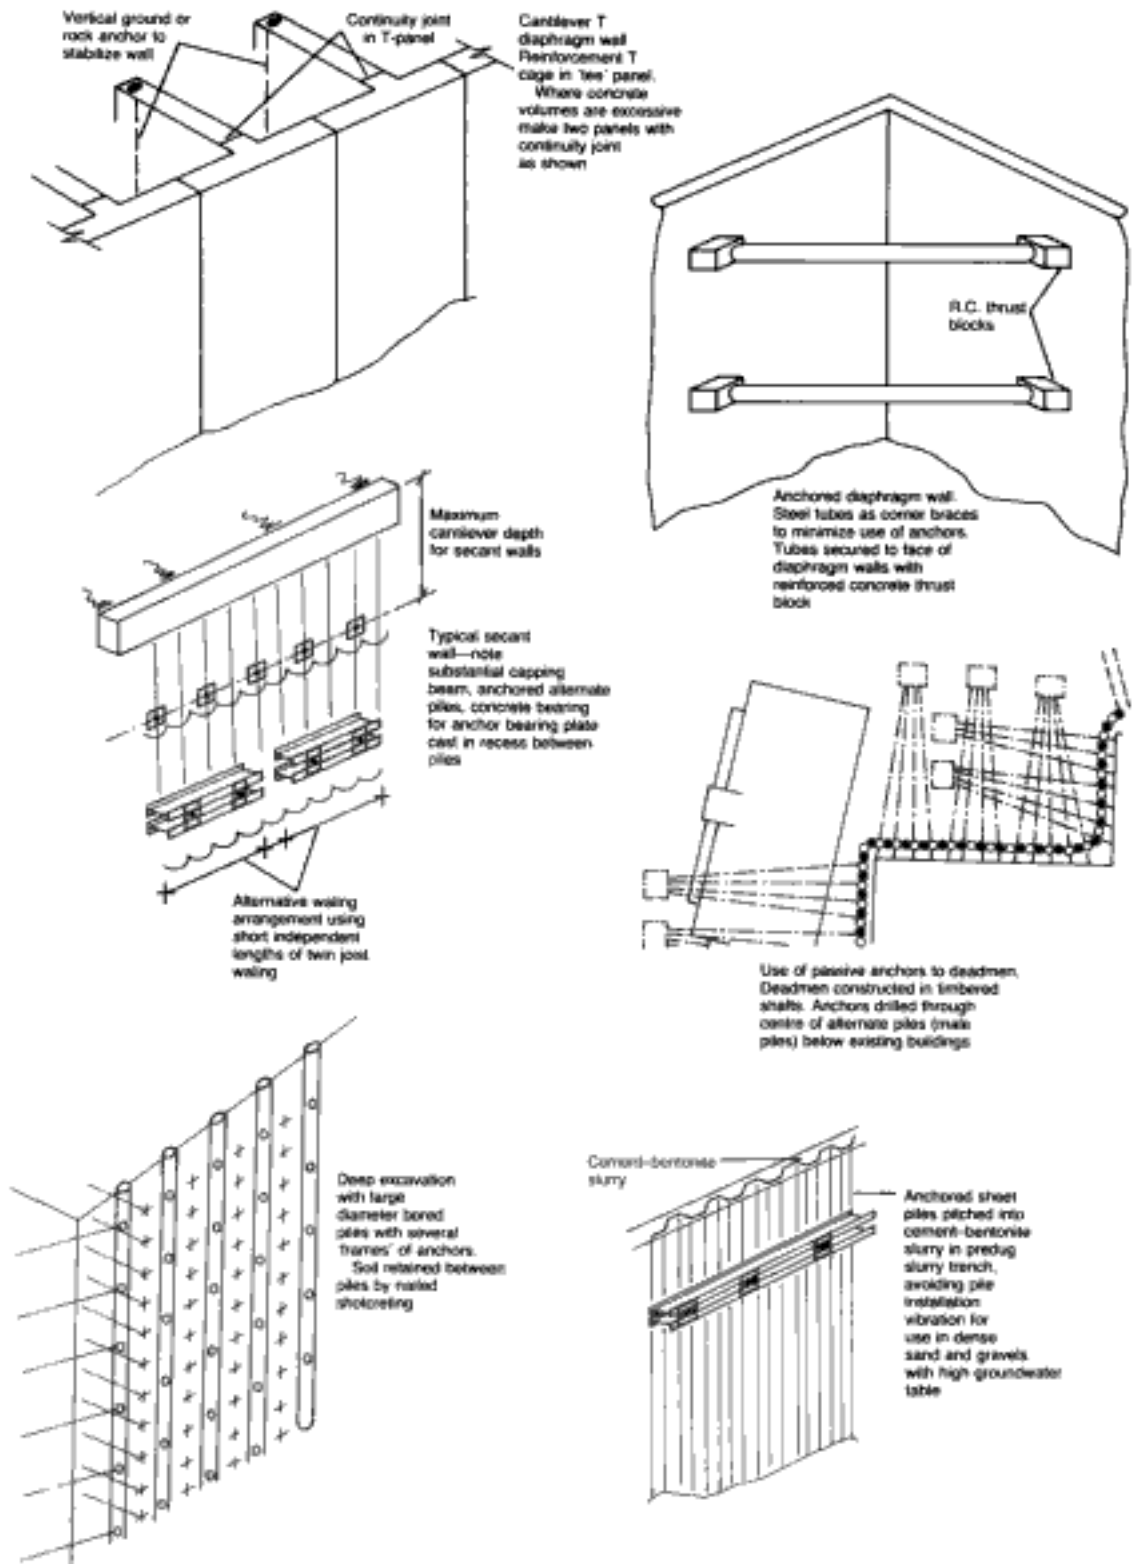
Schematic arrangements for anchored and braced piled and diaphragm walls
